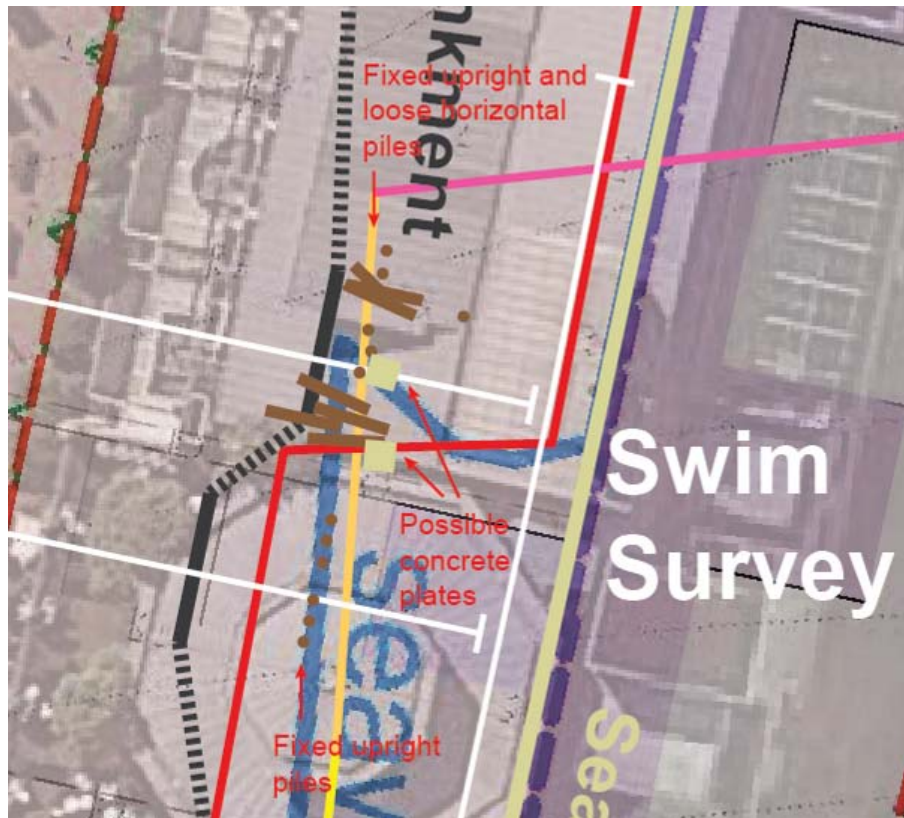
Overlay of timber and concrete features from Transect 5 and Transect 6 with rat-roofing retaining walls (yellow, red and pink lines, Figure 42) and seawall from 1985 plan (Figure 47).
